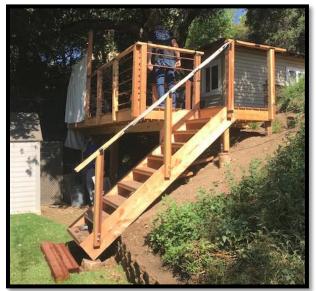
The deck is located off of an accessory structure and is built over the slope.
